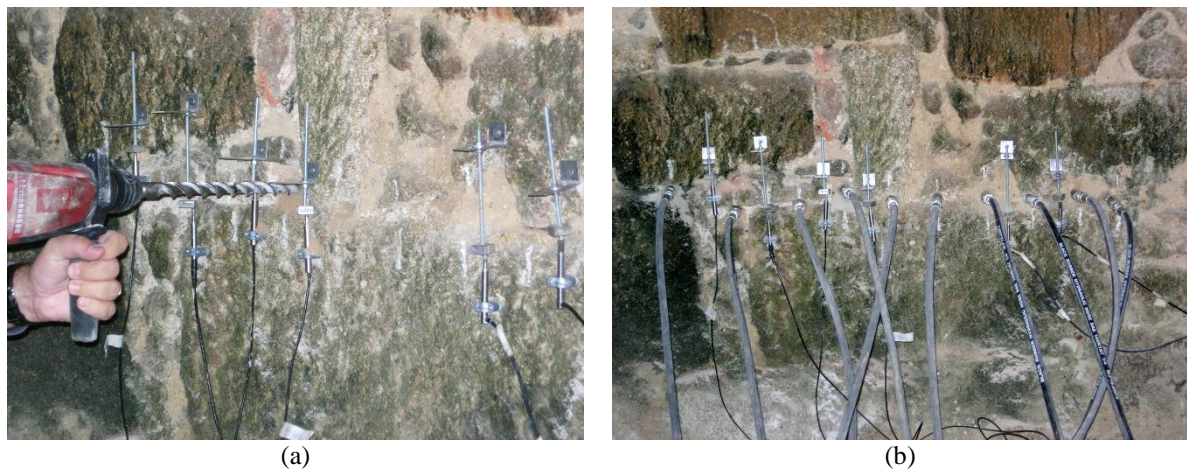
Photos of the single tube-jack test at the San Francisco Convent: (a) drilling the holes; and (b) complete setup with LVDTs attached, holes drilled, and tube-jacks inserted
